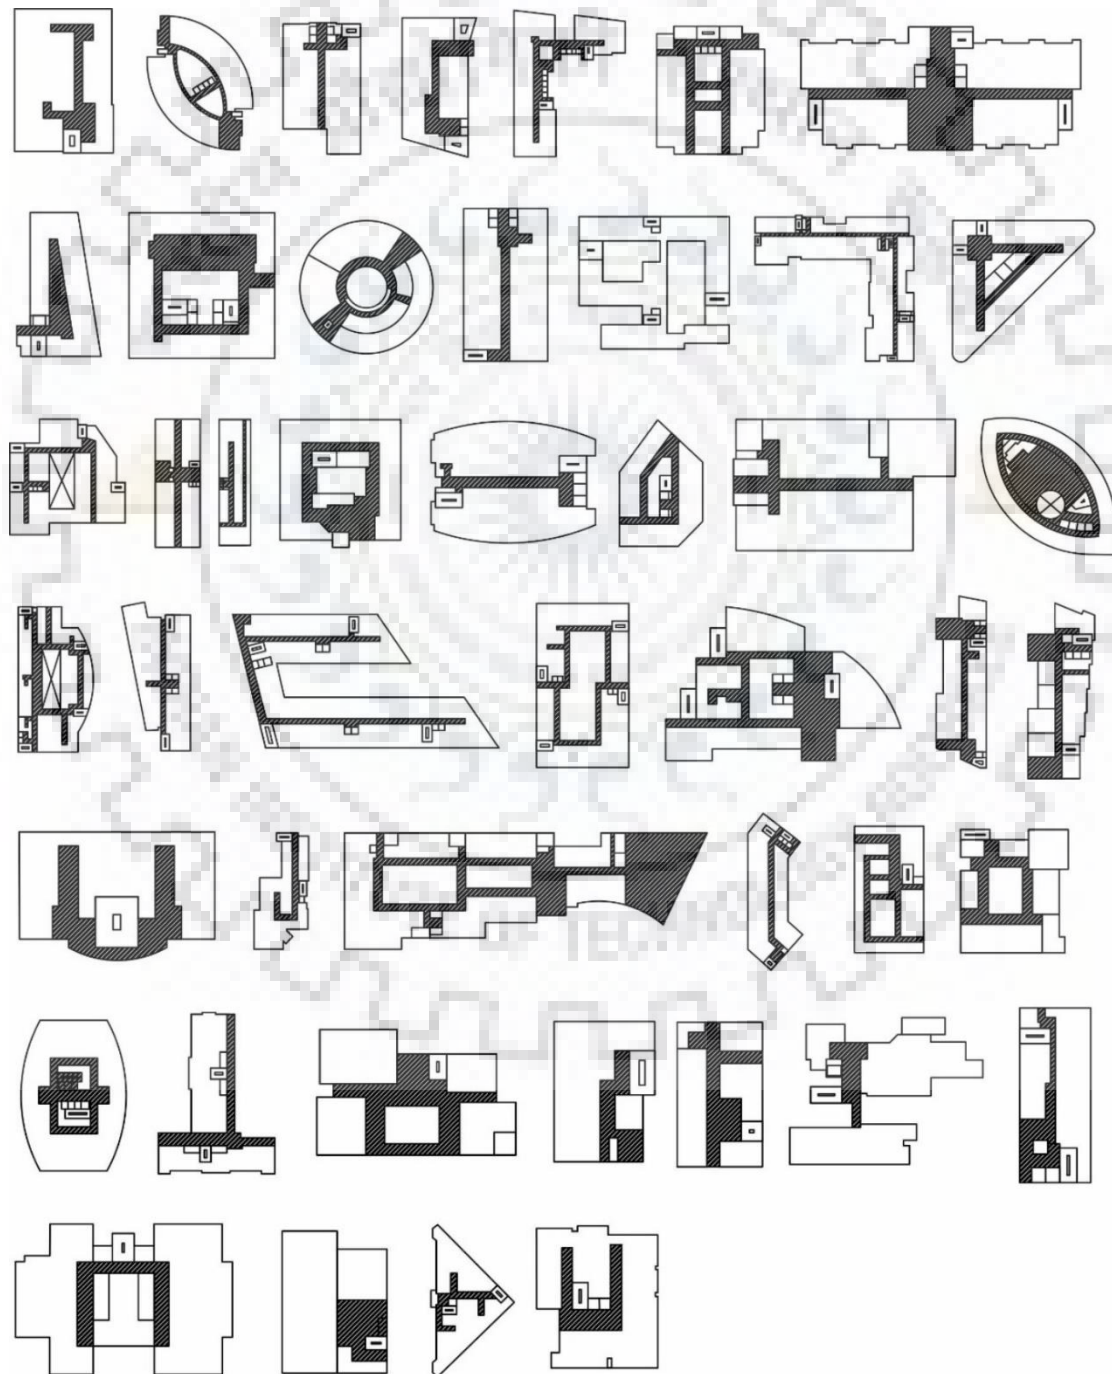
Plan Forms studied to Derive Typical Floor Layout
